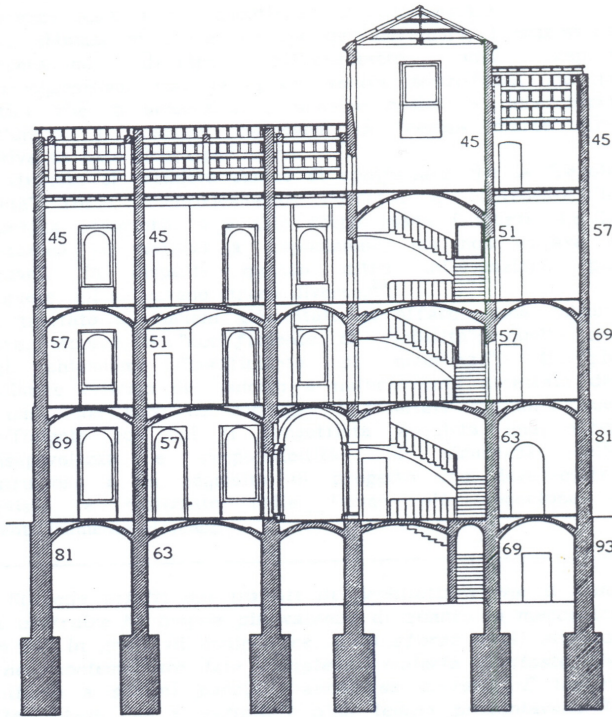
Section of an historic masonry building (Giuffrè A., 1990)
